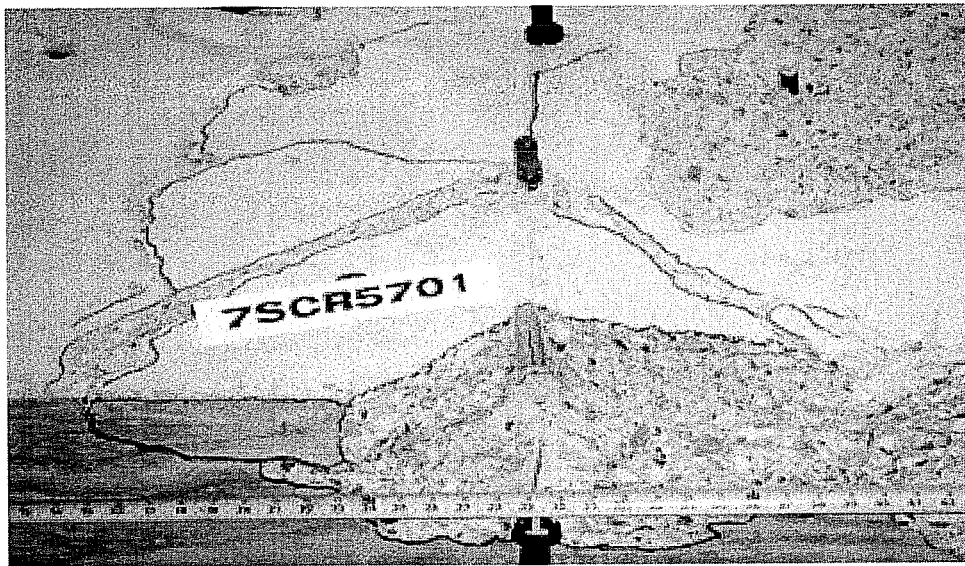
Cone Failure of Front Anchor with No Hairpin, Yielding and Pryout of Back Anchor, Along with Cracking toward Free Edge under Static Shear Loading
